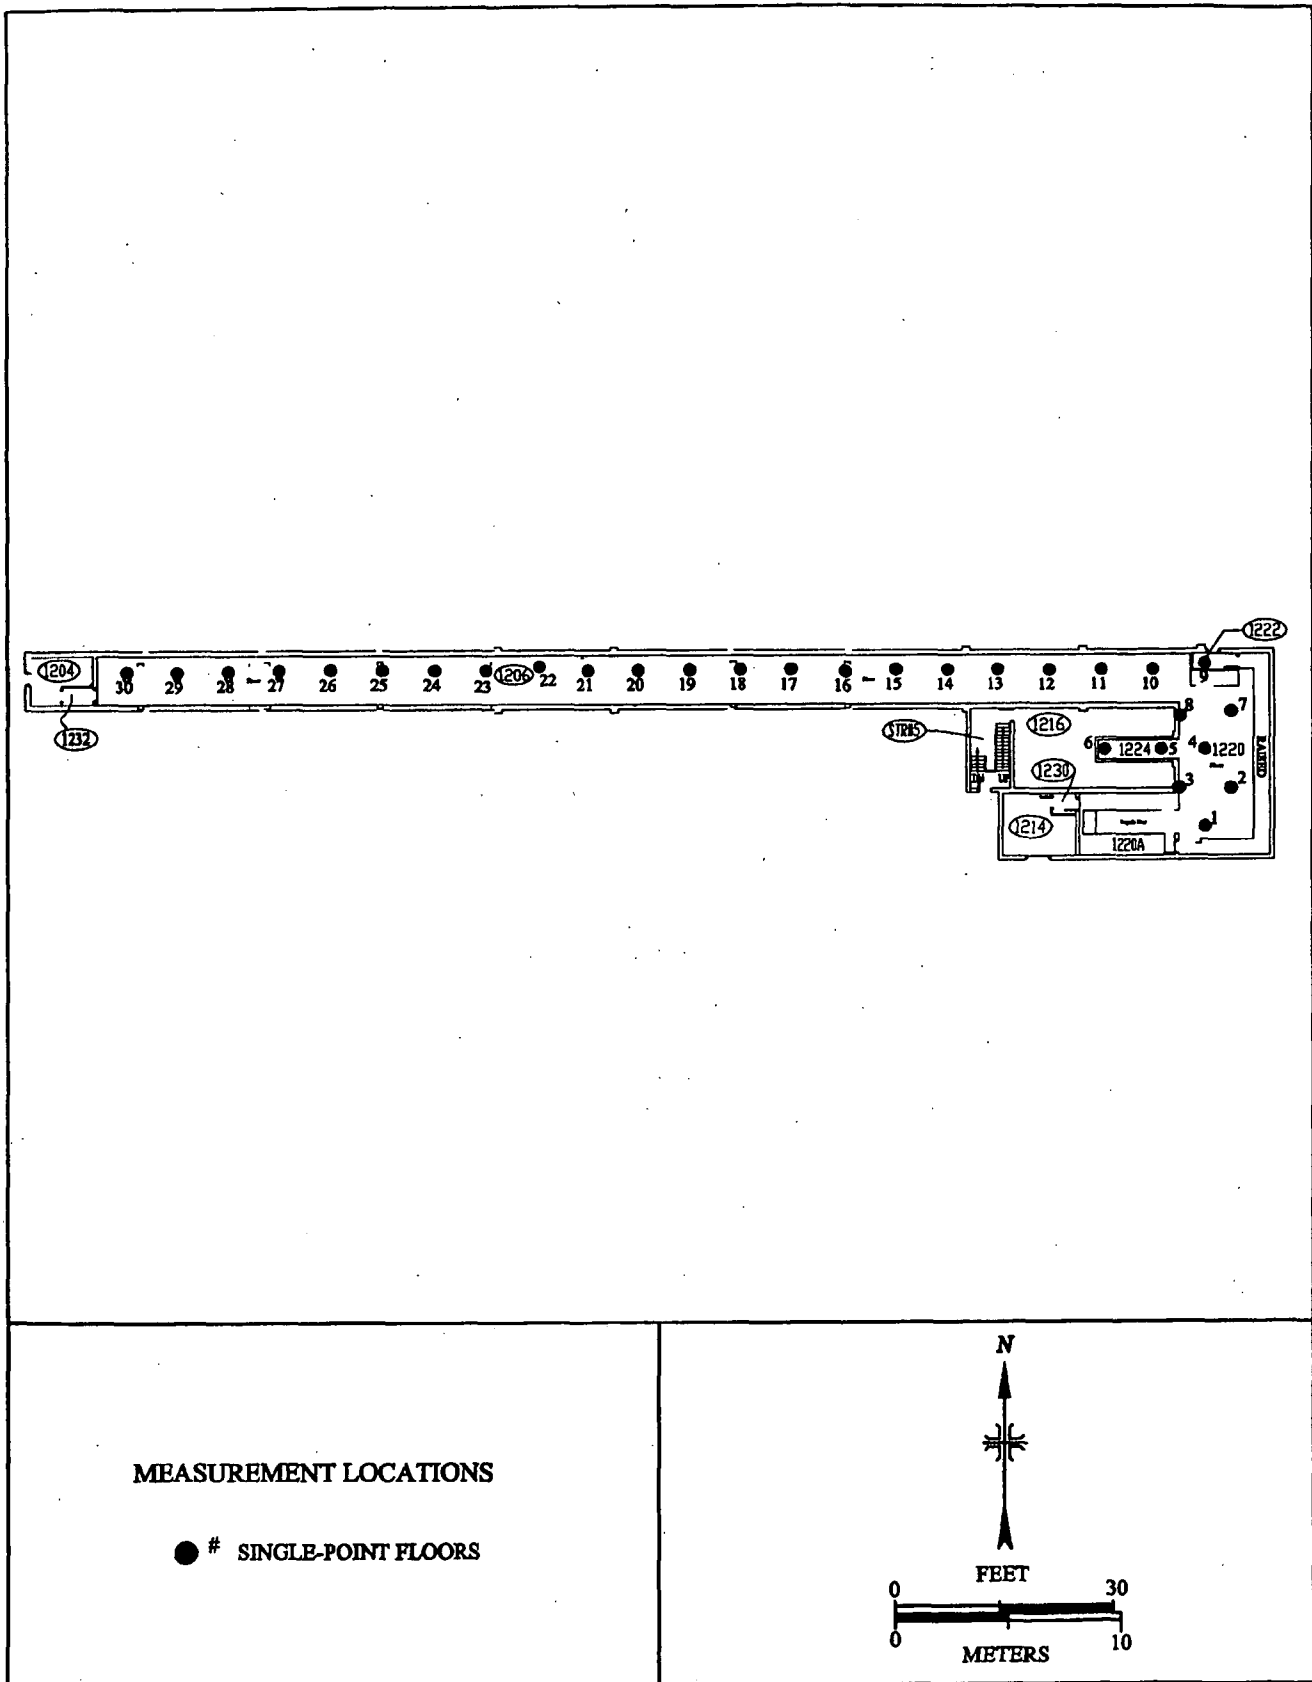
Building 371, Survey Area E - Measurement Locations
